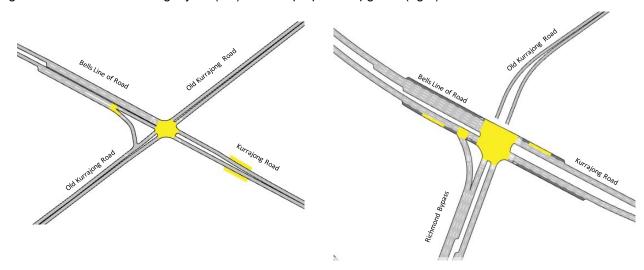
Bells Line of Road, Kurrajong Road and Old Kurrajong Road intersection (Location 3) – existing layout (left) and proposed upgrade (right)
